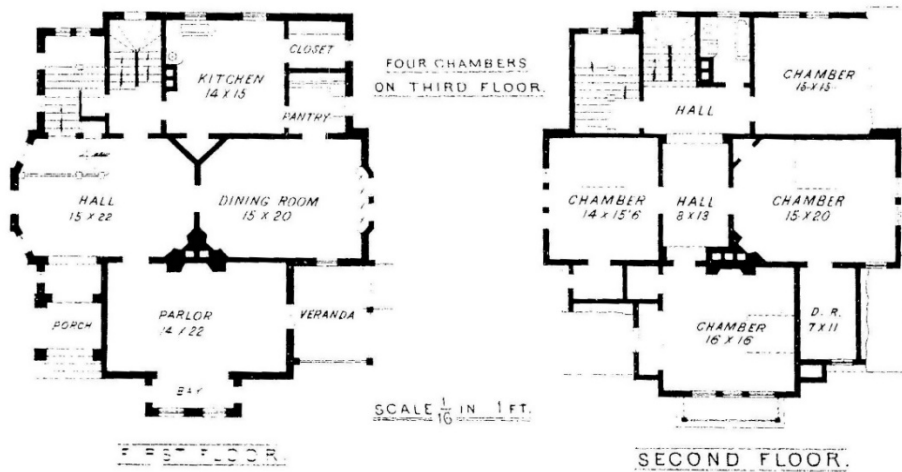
Plate 73, *Modern Architectural Designs and Details* (1881). “Brick and Frame Cottage,” designed by Gould and Angell.
